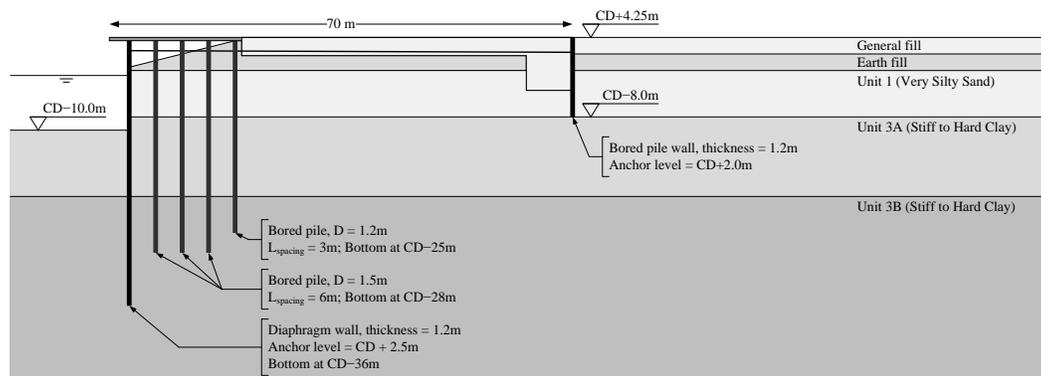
Schematic cross section of the New Baku International Sea Port quay wall.
